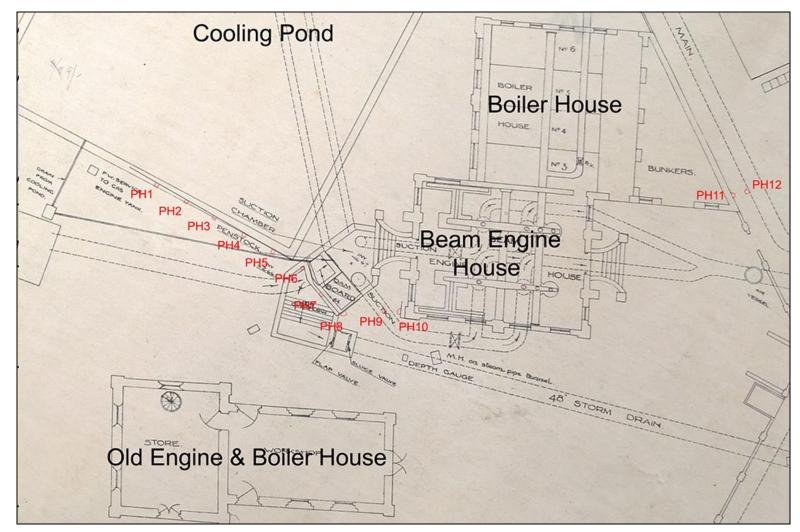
Extract from a plan dated 1928 showing the underground and overground layout of the pumping station, including the suction culvert under PH9 (courtesy of Debbie Scarrow, Portsmouth City Council, originals held in Portsmouth History Centre)
